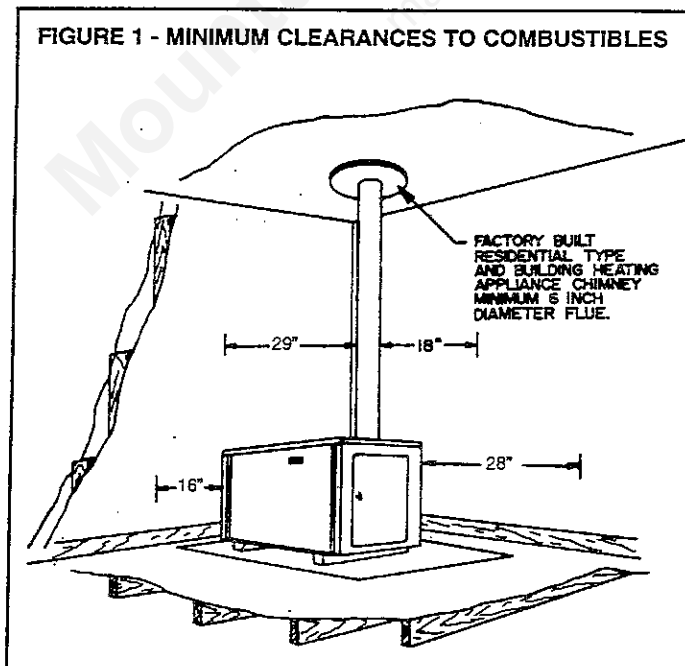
MINIMUM CLEARANCES TO COMBUSTIBLES
